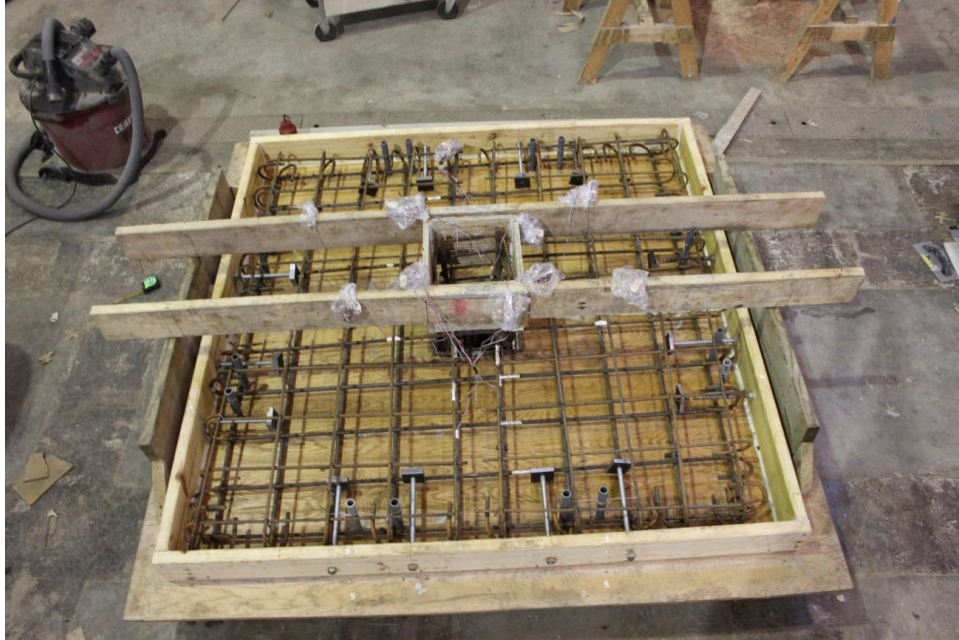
Completed slab formwork prior to concrete pour
